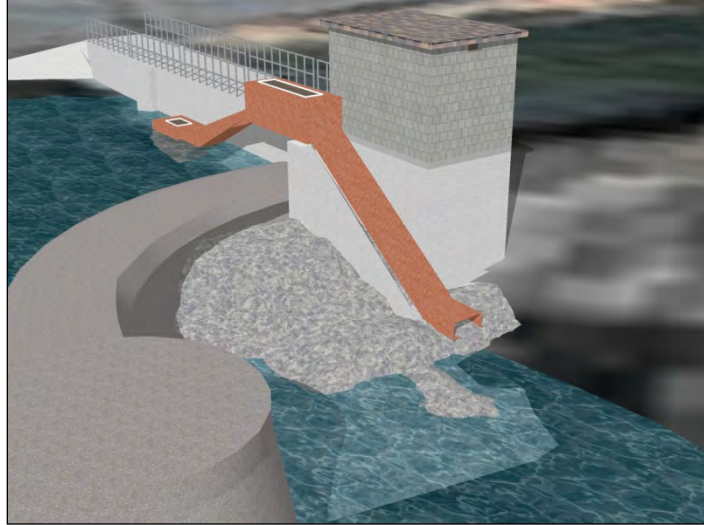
Concept of proposed LPS on the left bank at Prosser Dam. The existing structures of the dam are shown in grey with the proposed lamprey ramp in red.
